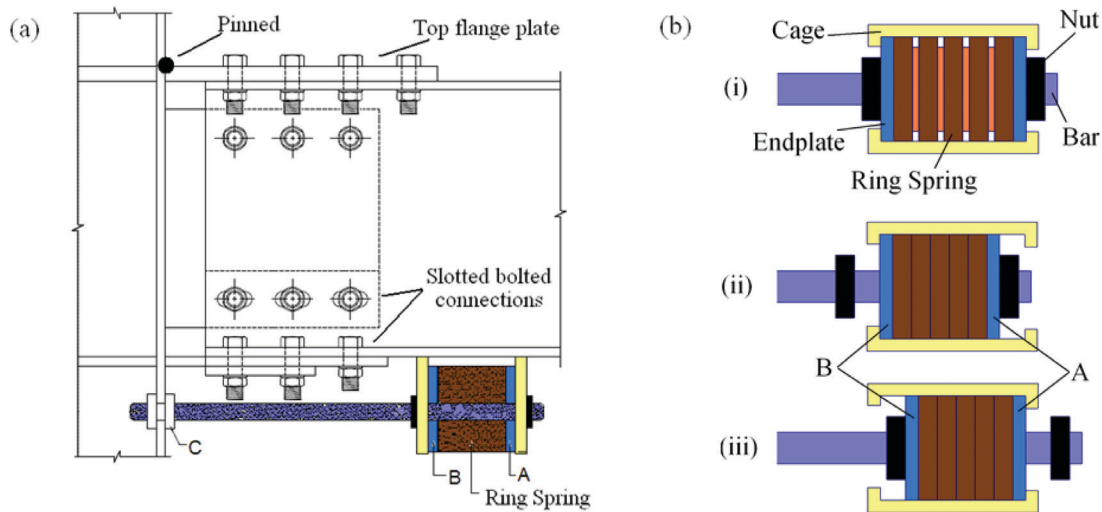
(a) Self-centering sliding hinge joint; (b) ring spring layout. (Figure courtesy of Professor G. Charles Clifton)
